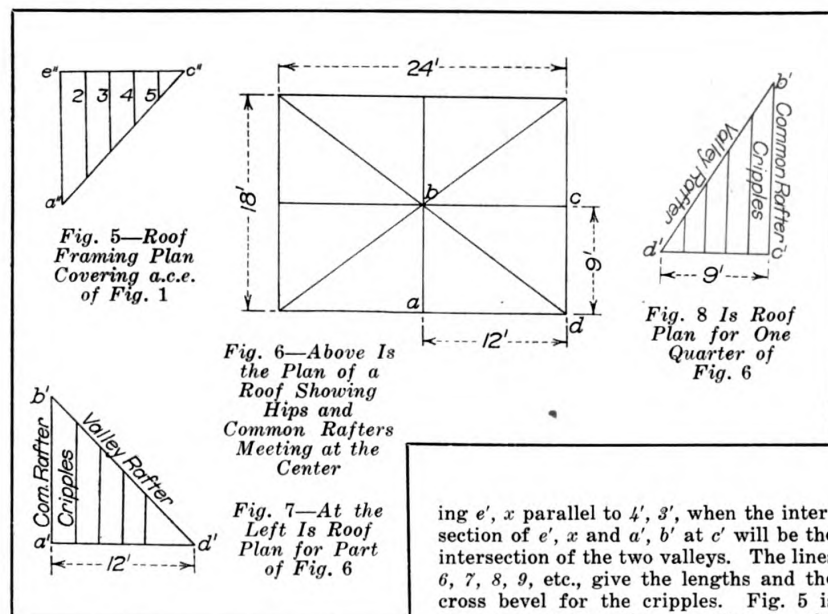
Roof Framing Plan Covering a.c.e. of Fig. 1
